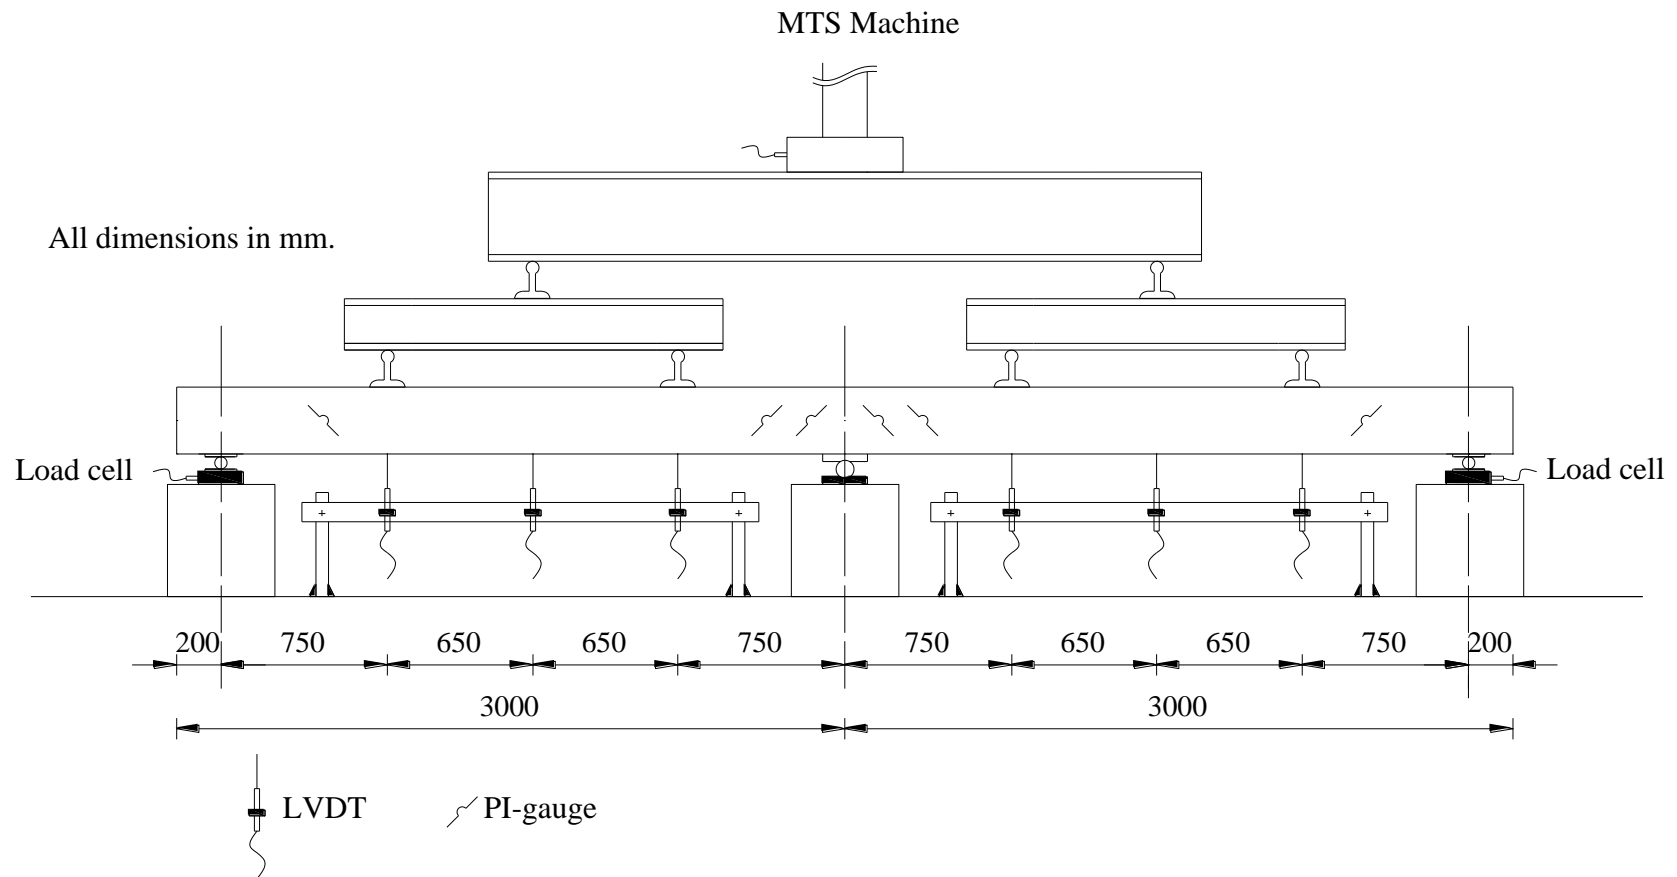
Test setup and instrumentations of test beams with 250 mm effective depth
